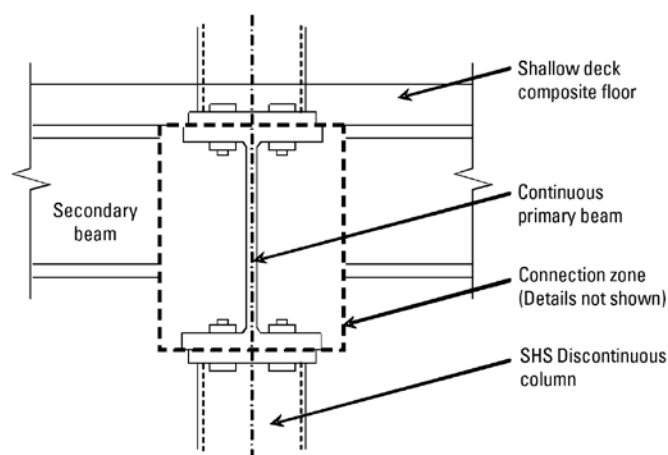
Shallow deck composite floor slab on top flange of floor beam with discontinuous columns
